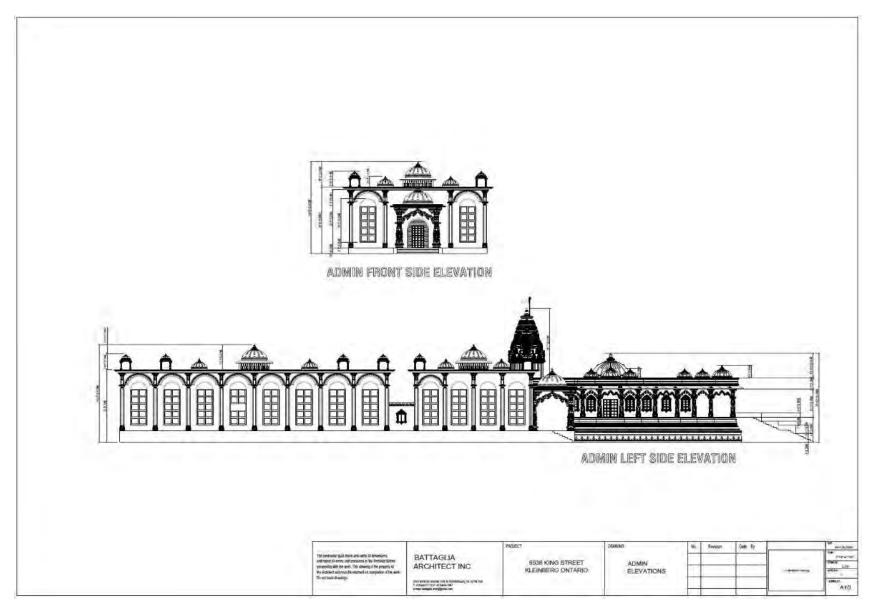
Proposed admin office elevations (Battaglia Architects Inc)
